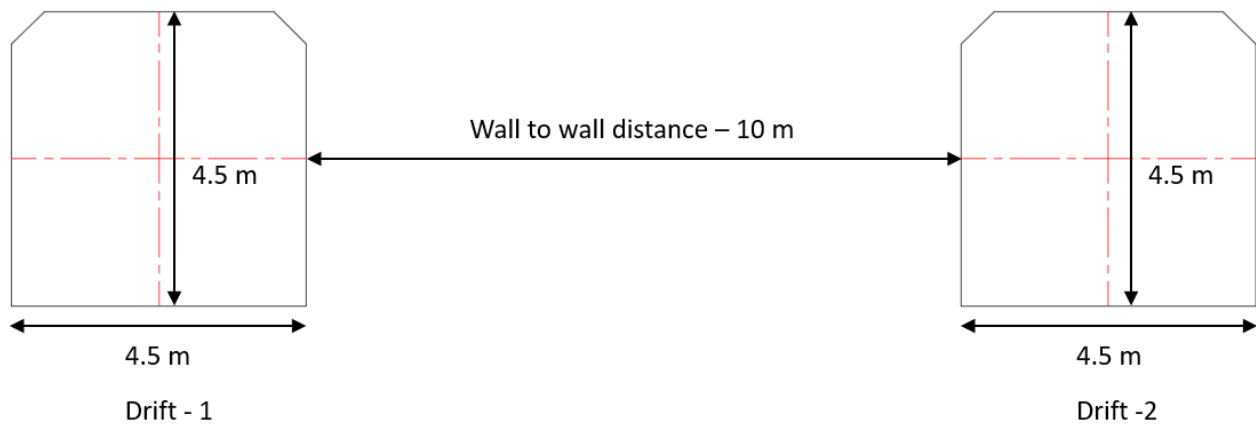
Schematic showing model geometry for 10 m wall to wall distance at LaRonde mine
